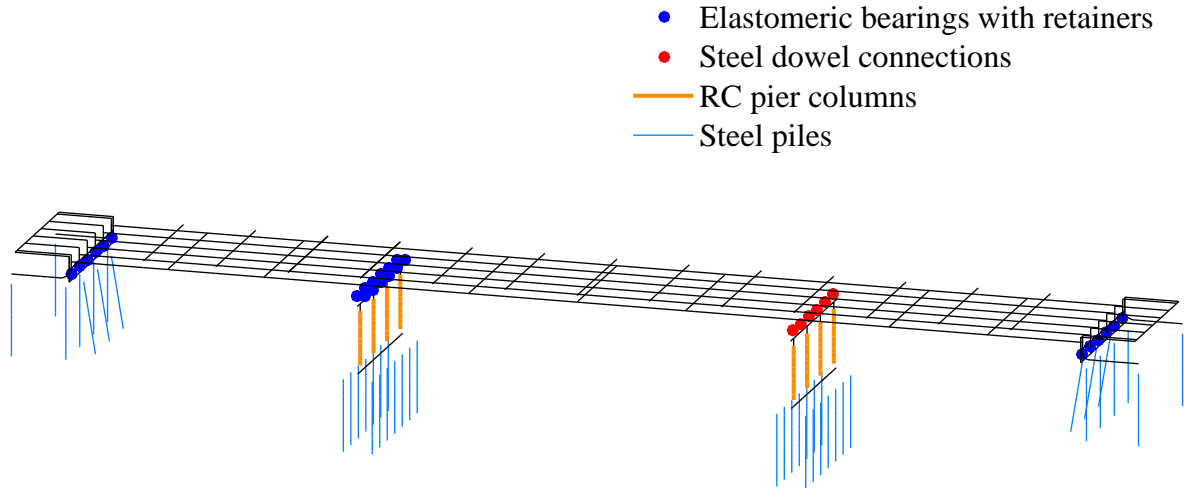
Vertical and batter abutment piles in the finite-element bridge model
